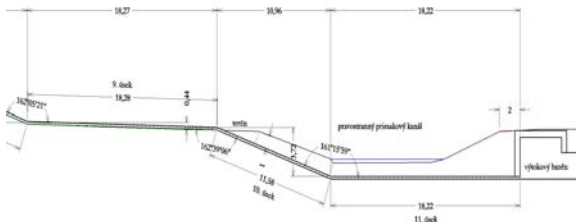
Diagram of 9. – 11. section for the siphon pipe and exit to outlet pool
